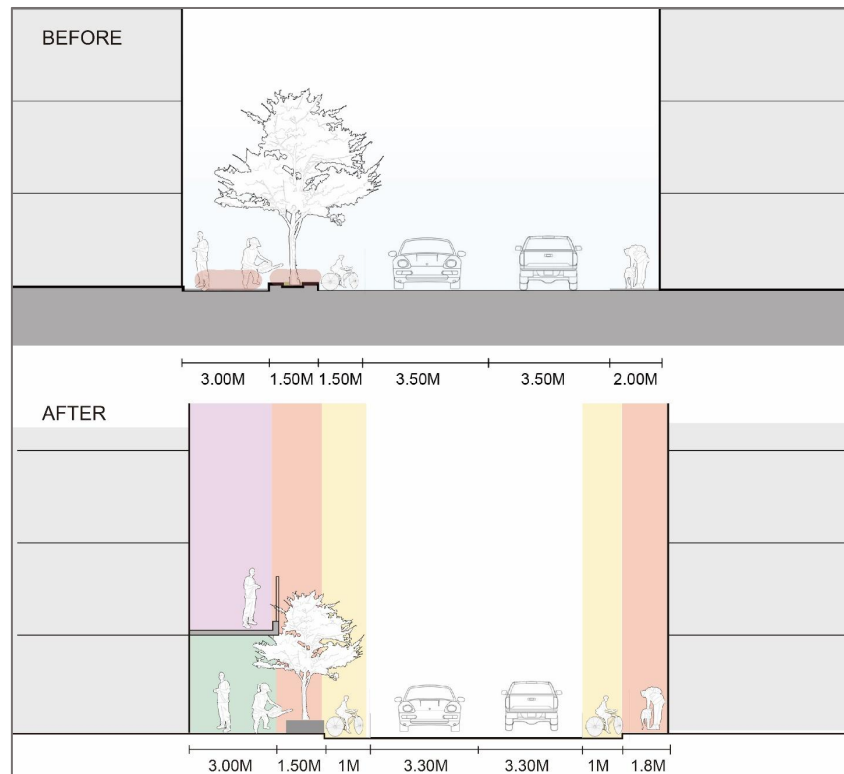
19 Schematic Diagram of Road Profile Improvement of Shigang Road
